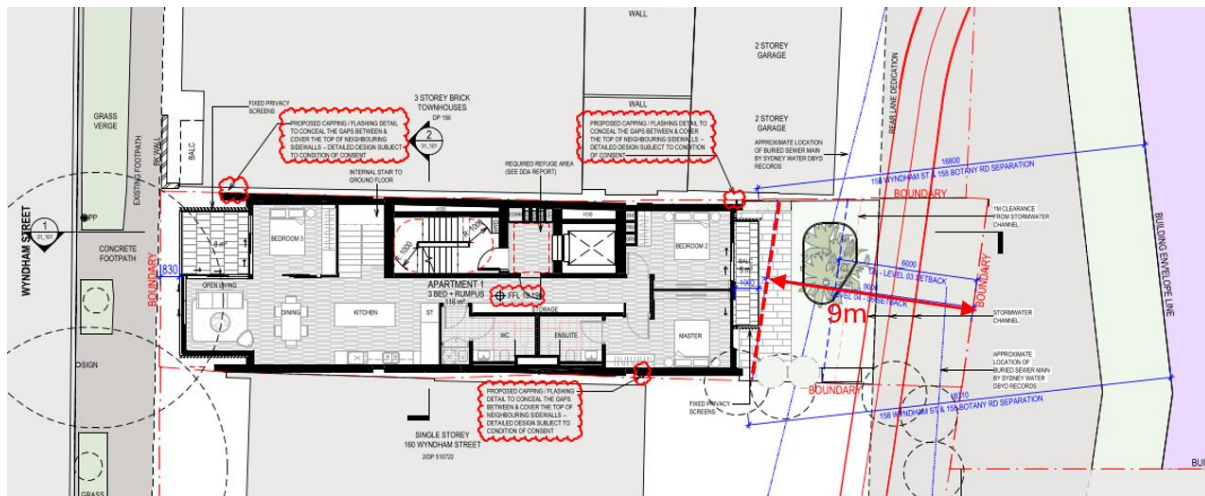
First floor plan showing proposed 9m setback to the rear boundary
